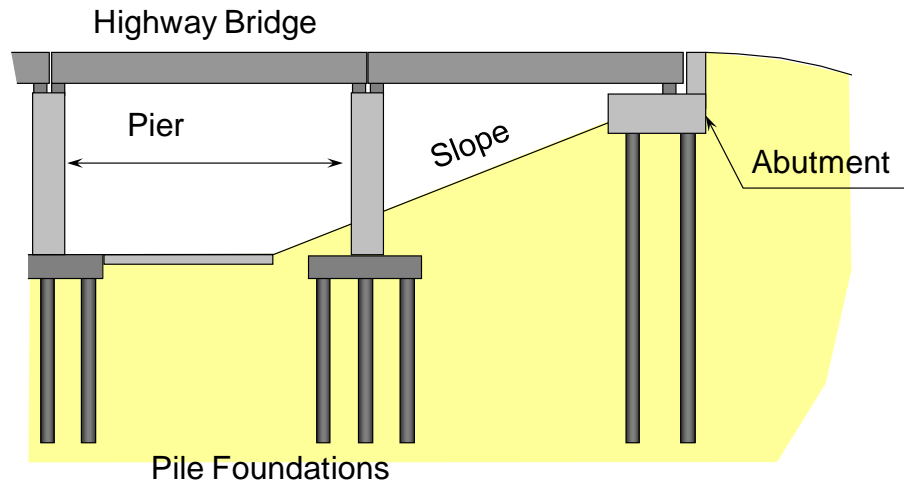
Typical bridge foundation (after Nimityongskul, 2010)
